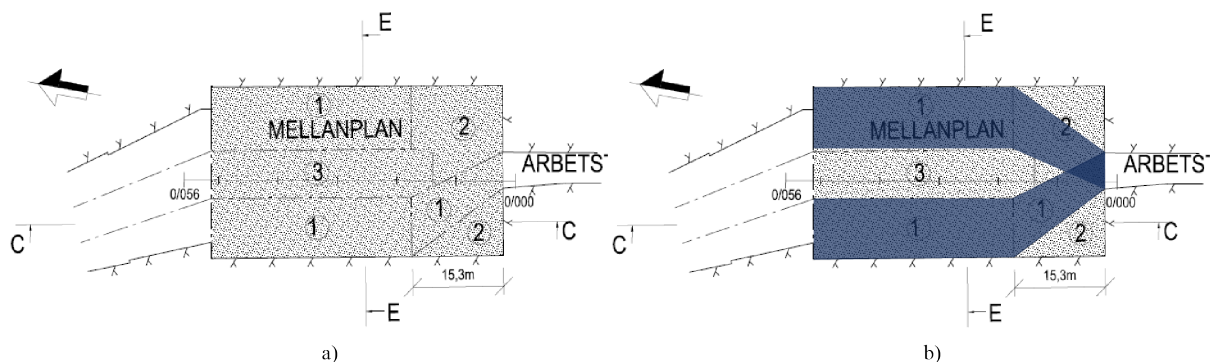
Plan view of Mellanplan from above. a) Initial excavation sequence design. b) Blue overlay illustrates current shape of the excavated pilot tunnels. Modified after: Trafikverket (2022d).
